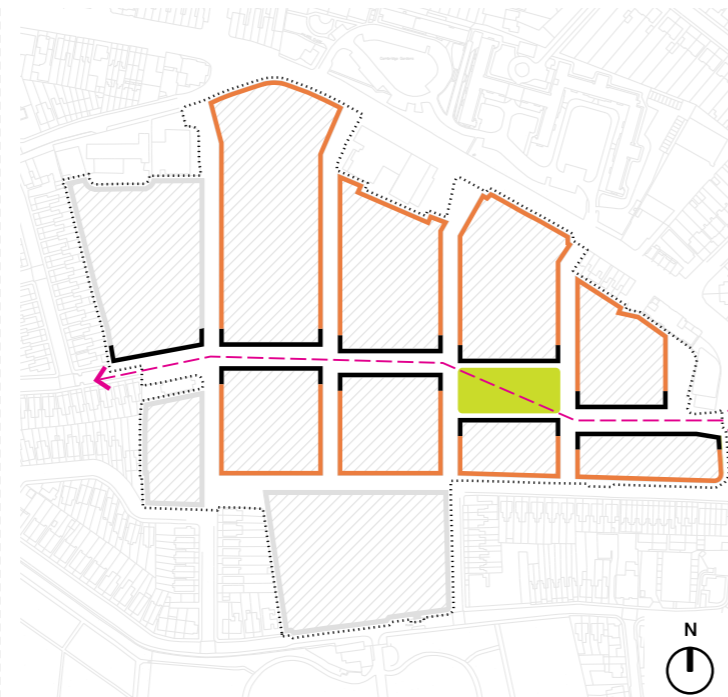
Principal east:west route: Key relationships define building façades and subdivision of Development Plots.
